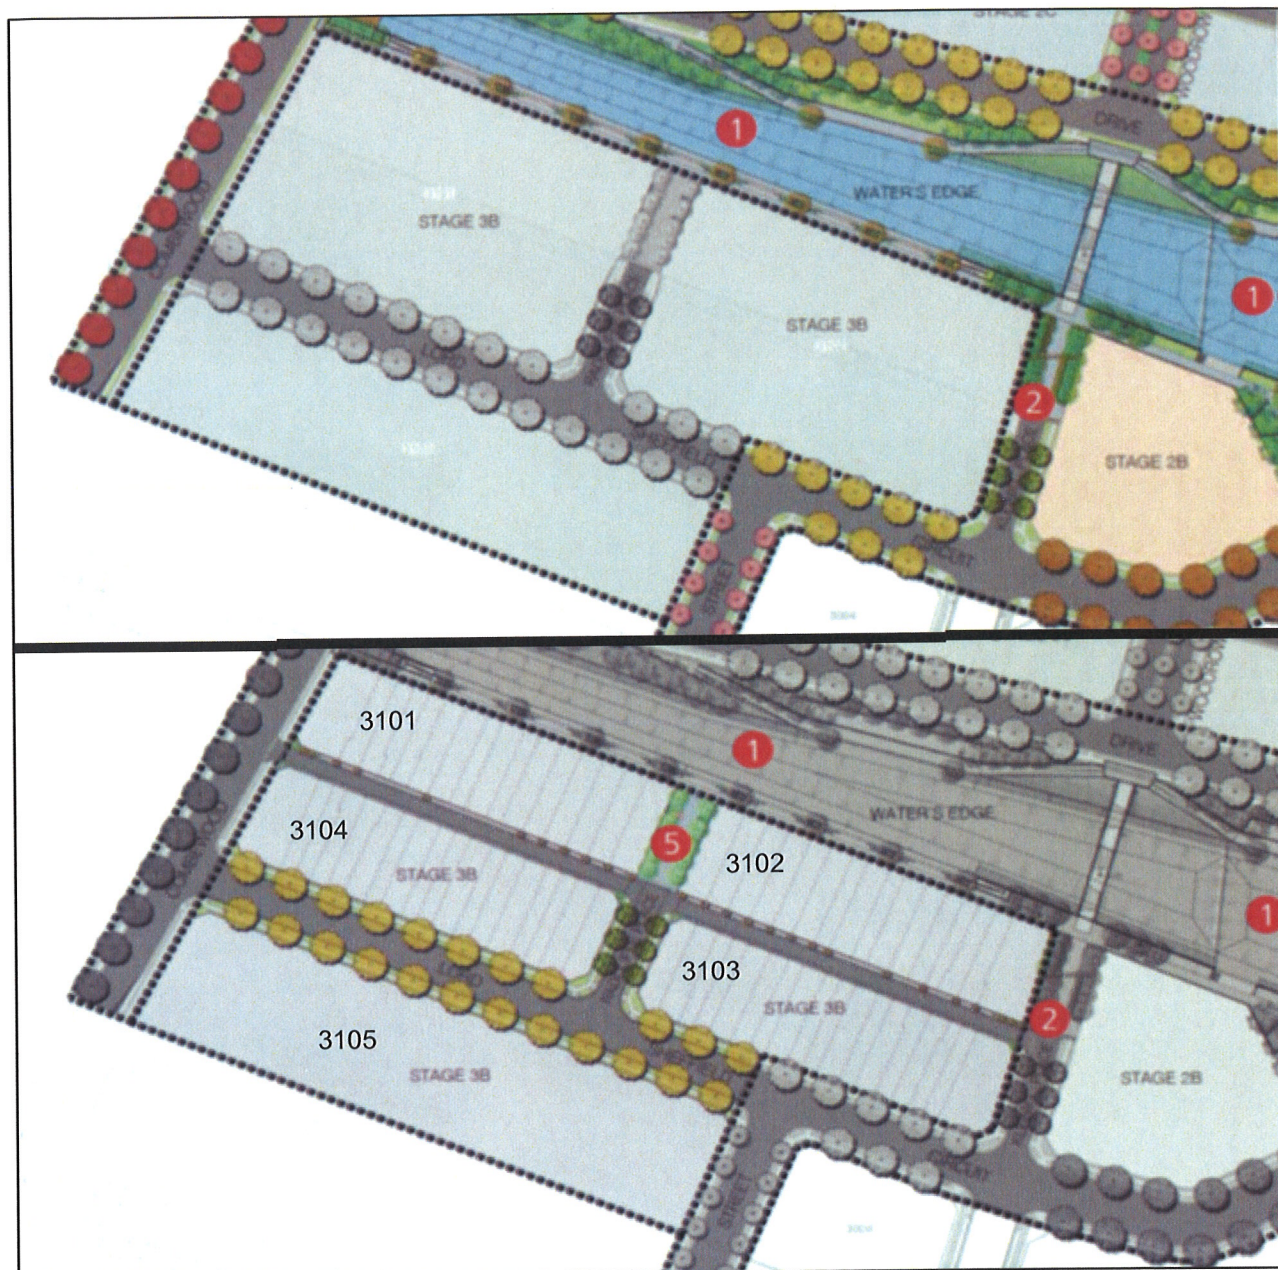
Comparison of approved (above) and proposed (below) subdivision, landscaping and road layout
